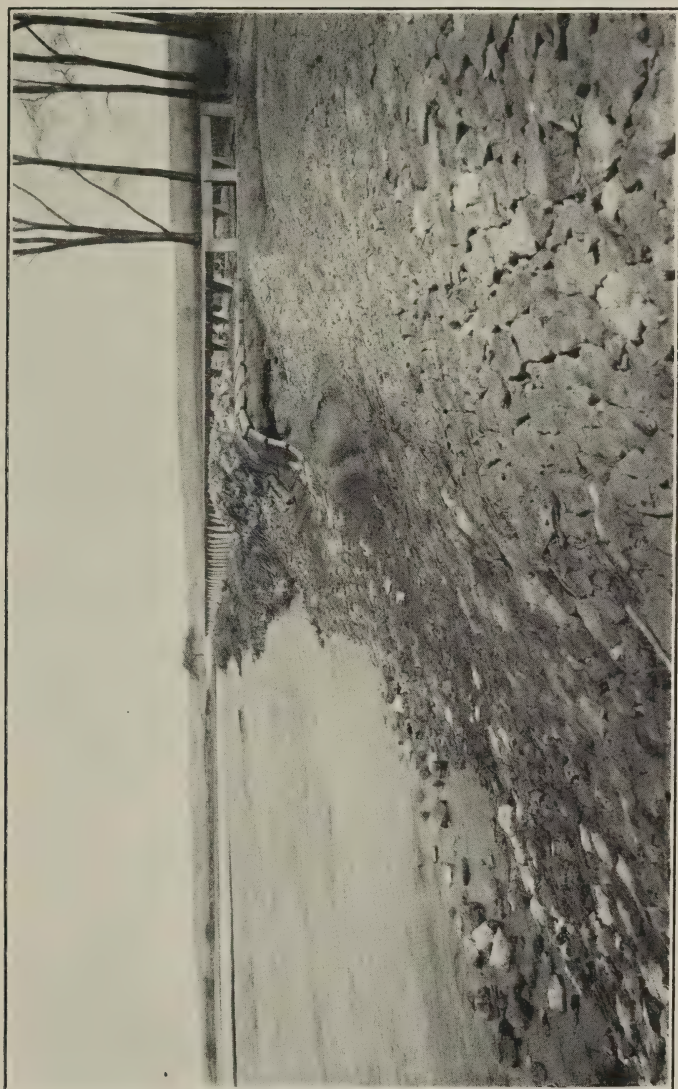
Lower end upper concrete dike, Fort Riley, Kans., with extension of riprap revetment.
